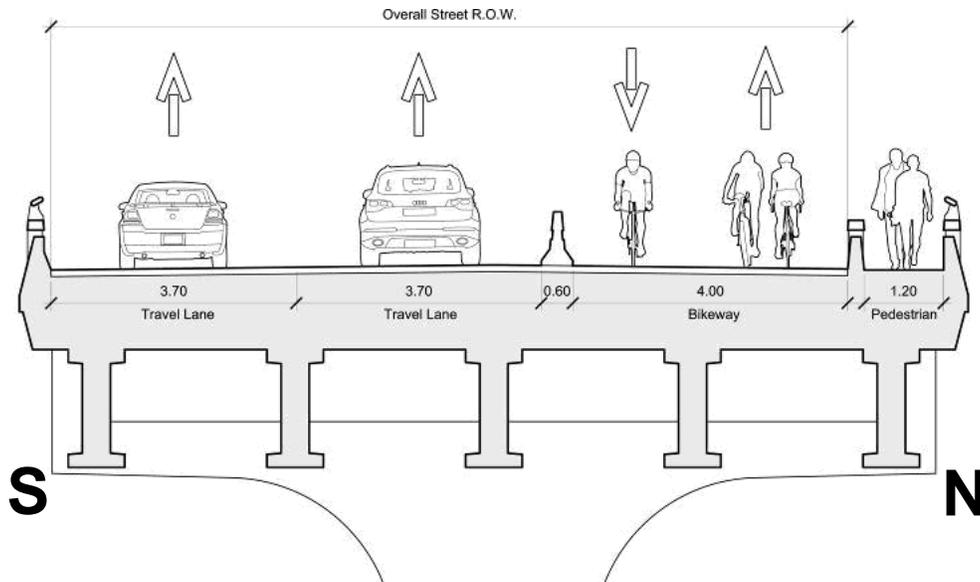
Proposed cross-section of Dunsmuir Viaduct (looking west)
